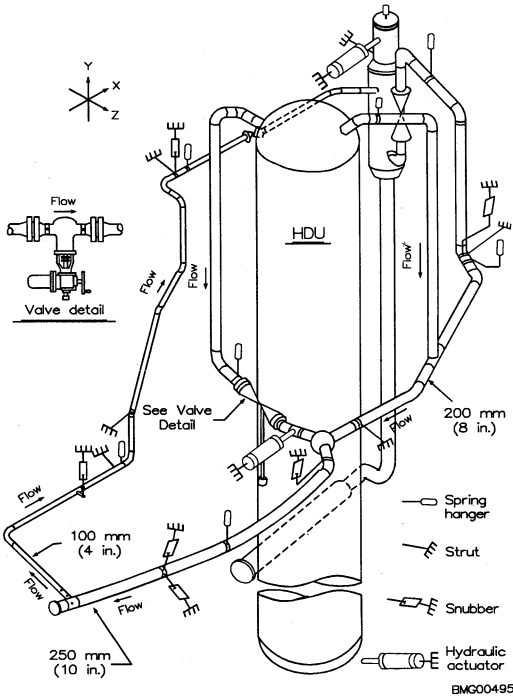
The VKL with servo-hydraulic shakers and other equipment installed for the SHAM test series.
